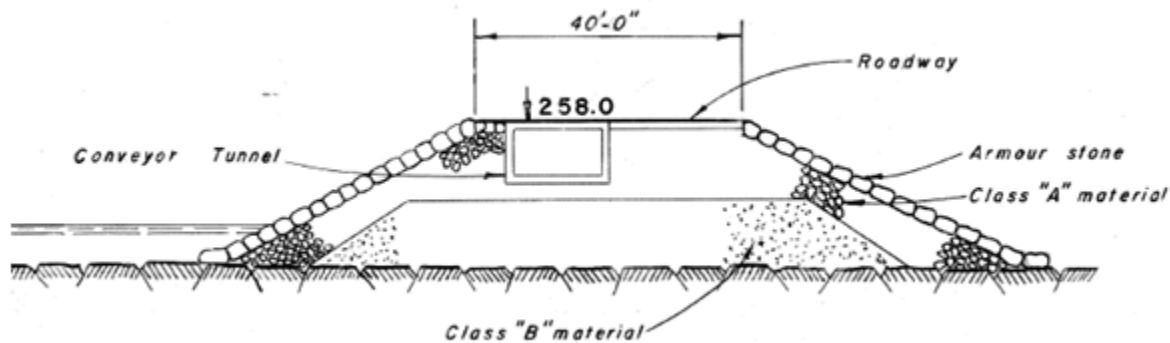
Typical cross-section of rubble mound structure (Dwg. No. NA21-EY-1/1)
